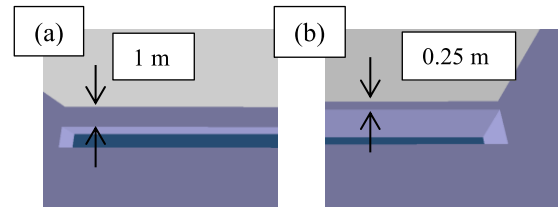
Zoomed-in view of the open-trench drains surrounding various buildings. (a) 1 m away from the wall. (b) 0.25 m away from the wall (not to scale).
